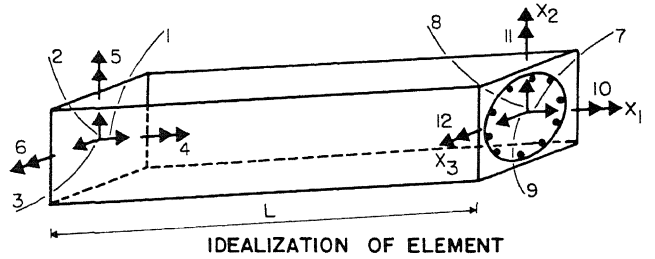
REINFORCED CONCRETE COLUMN STIFFNESS ELEMENT
